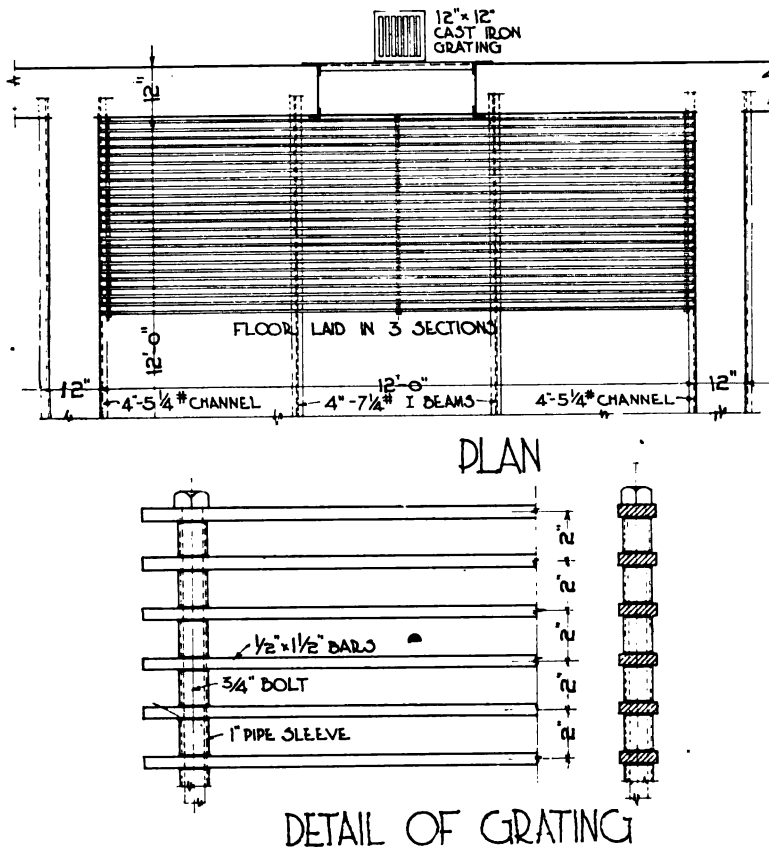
DETAIL OF SMOKE HOUSE FLOOR.
